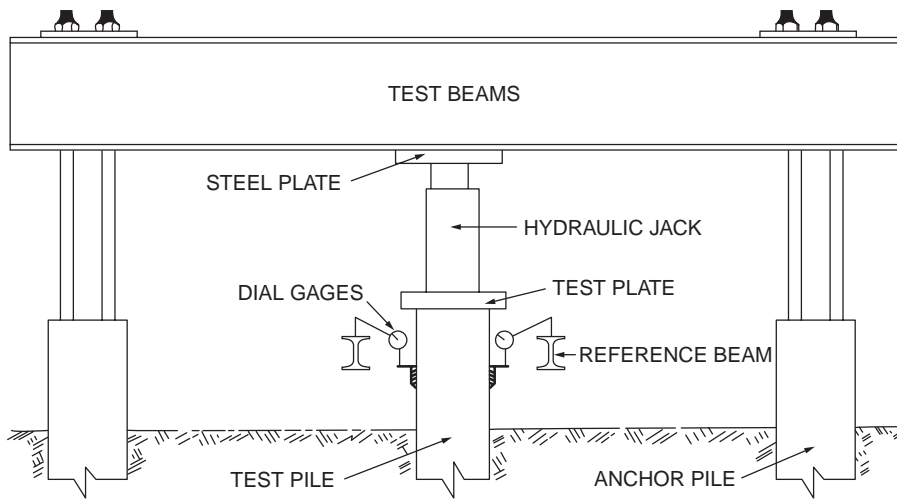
Set-up for pile static load test. (From ASTM D 1143 - 81 (Reapproved 1987). Standard method for piles under static compressive load. With permission.)
